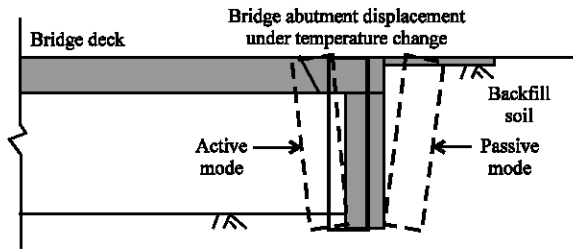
Abutment wall active and passive states (Horvest, 2005)
